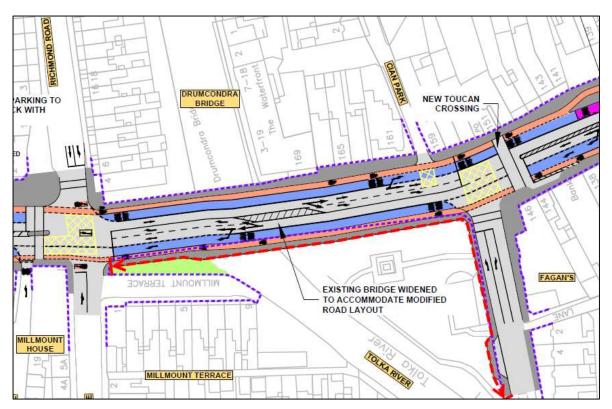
Emerging Preferred Route layout - Tolka River bridge
